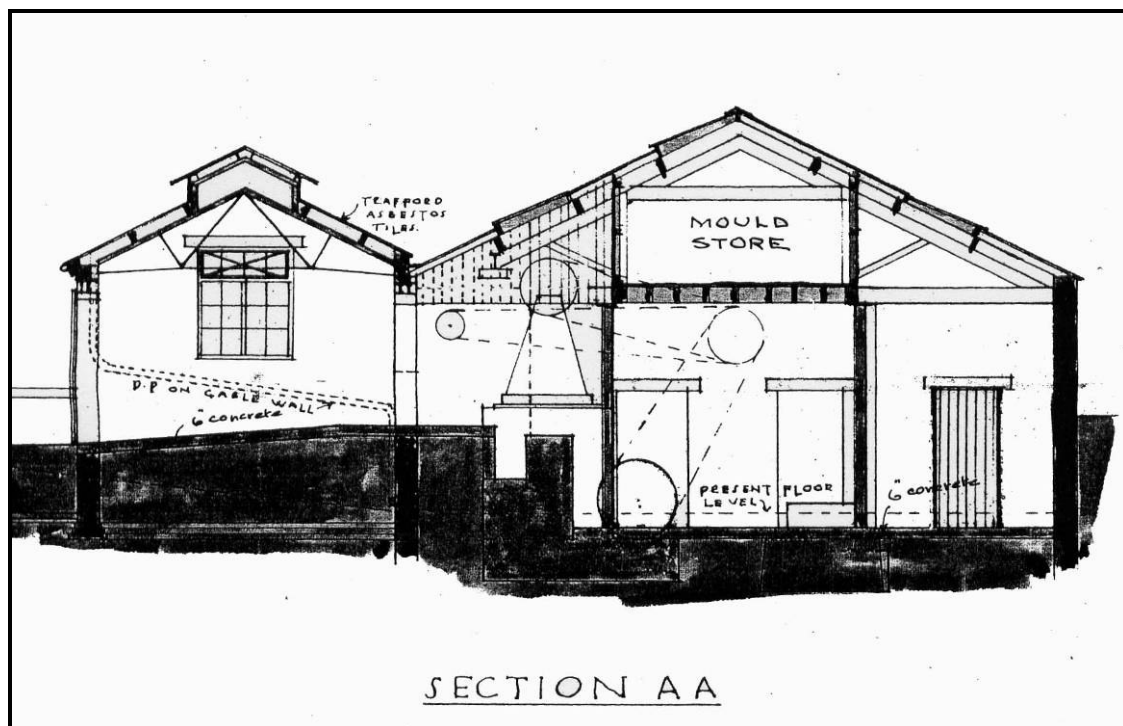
West facing cross-section of the New Mould Shed in Building Y in 1929 (WPM)
